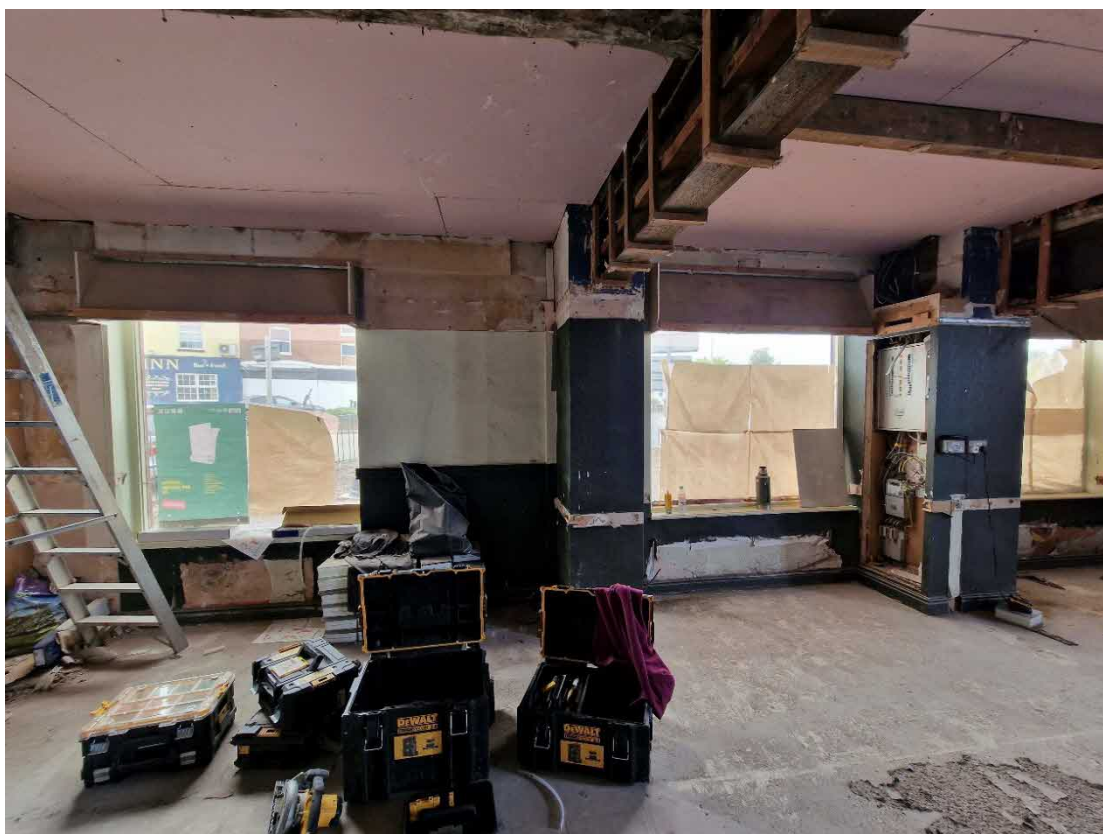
Southern area of the restaurant with windows to Coleshill Street
